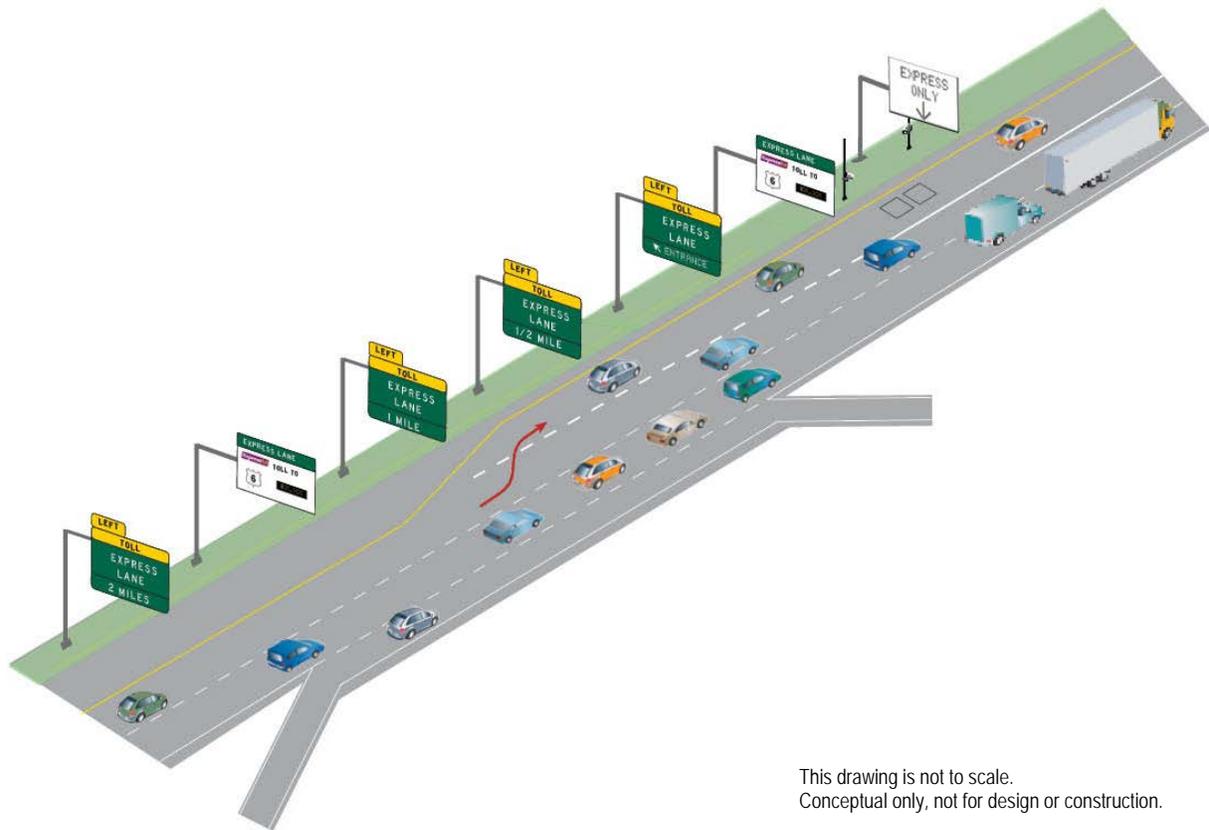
Conceptual Signing and Striping Plan for Ingress Access Zone
